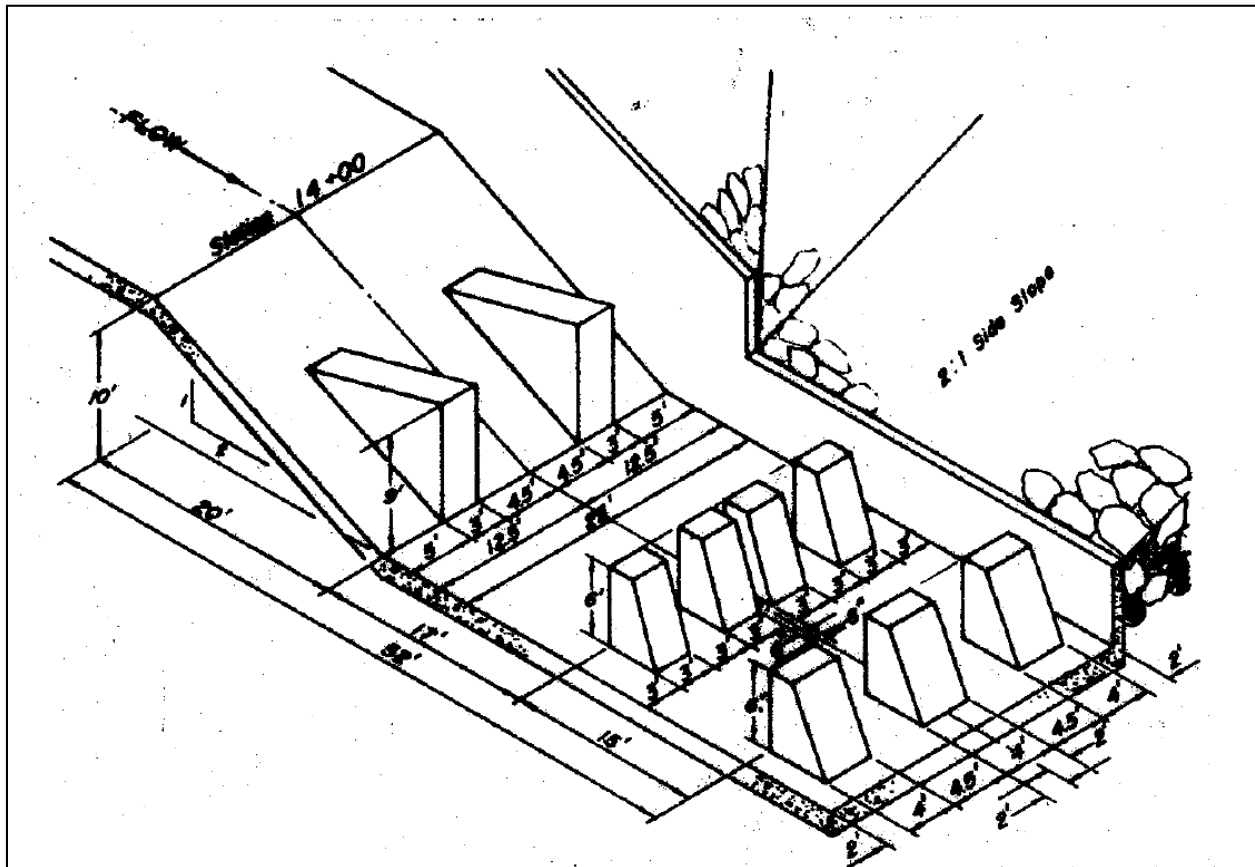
Perspective view of the energy dissipator downstream of Beachmont Street on Arundell Barranca
